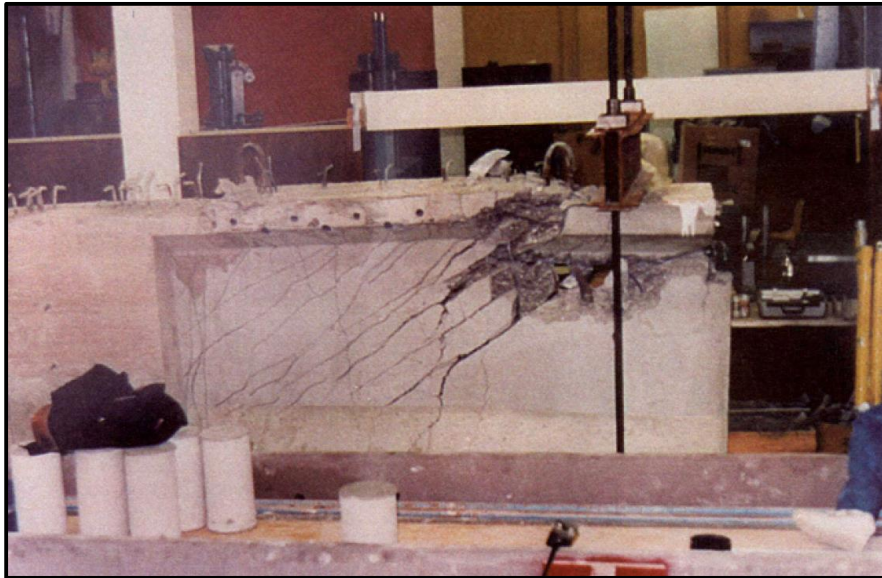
Test specimen after failure (from Tadros et al., 1993)
